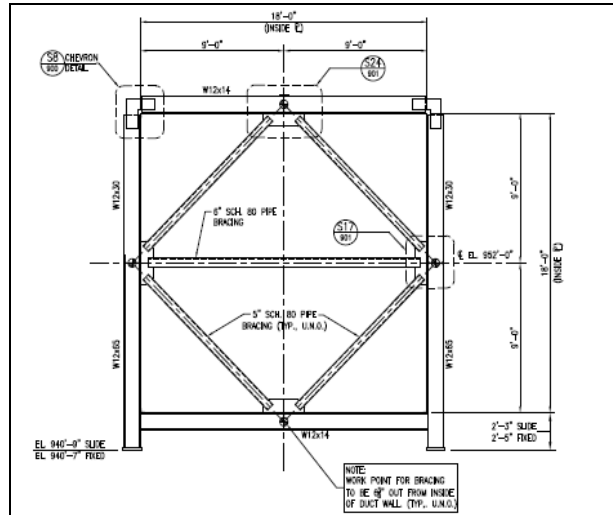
External pinned frame with internal truss inside 18 foot wide by 18 foot high duct.
